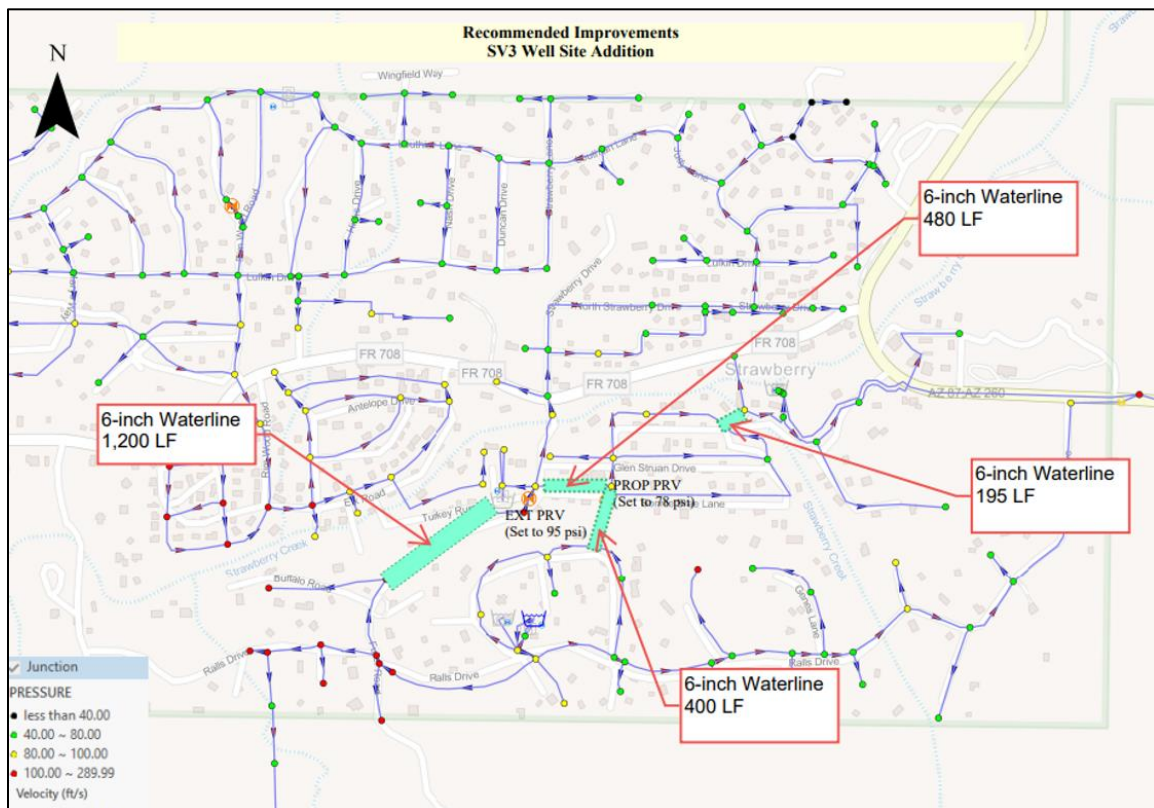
Site plan showing the proposed waterline improvement locations (shaded in green), waterline size, and linear feet to be improved
